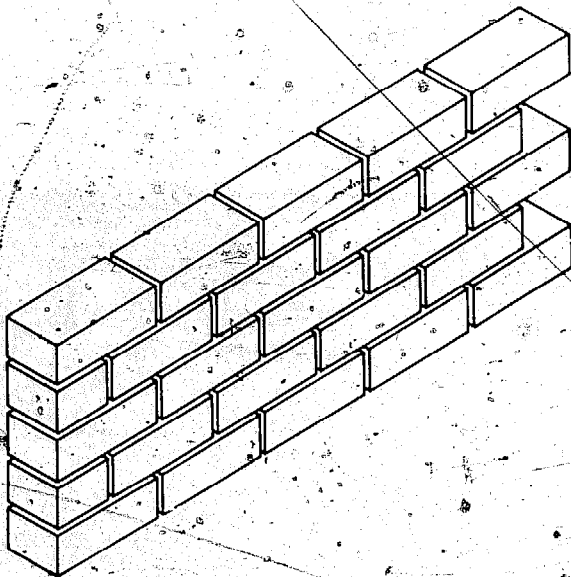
Bonding of walls of soil-cement blocks laid as stretchers.
